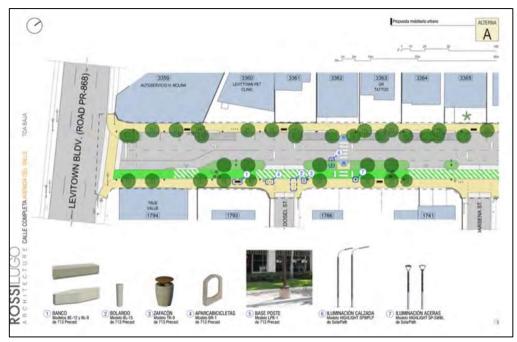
Detail of Street Furniture Partial Plan – ROSSILUGO ARCHITECTURE
